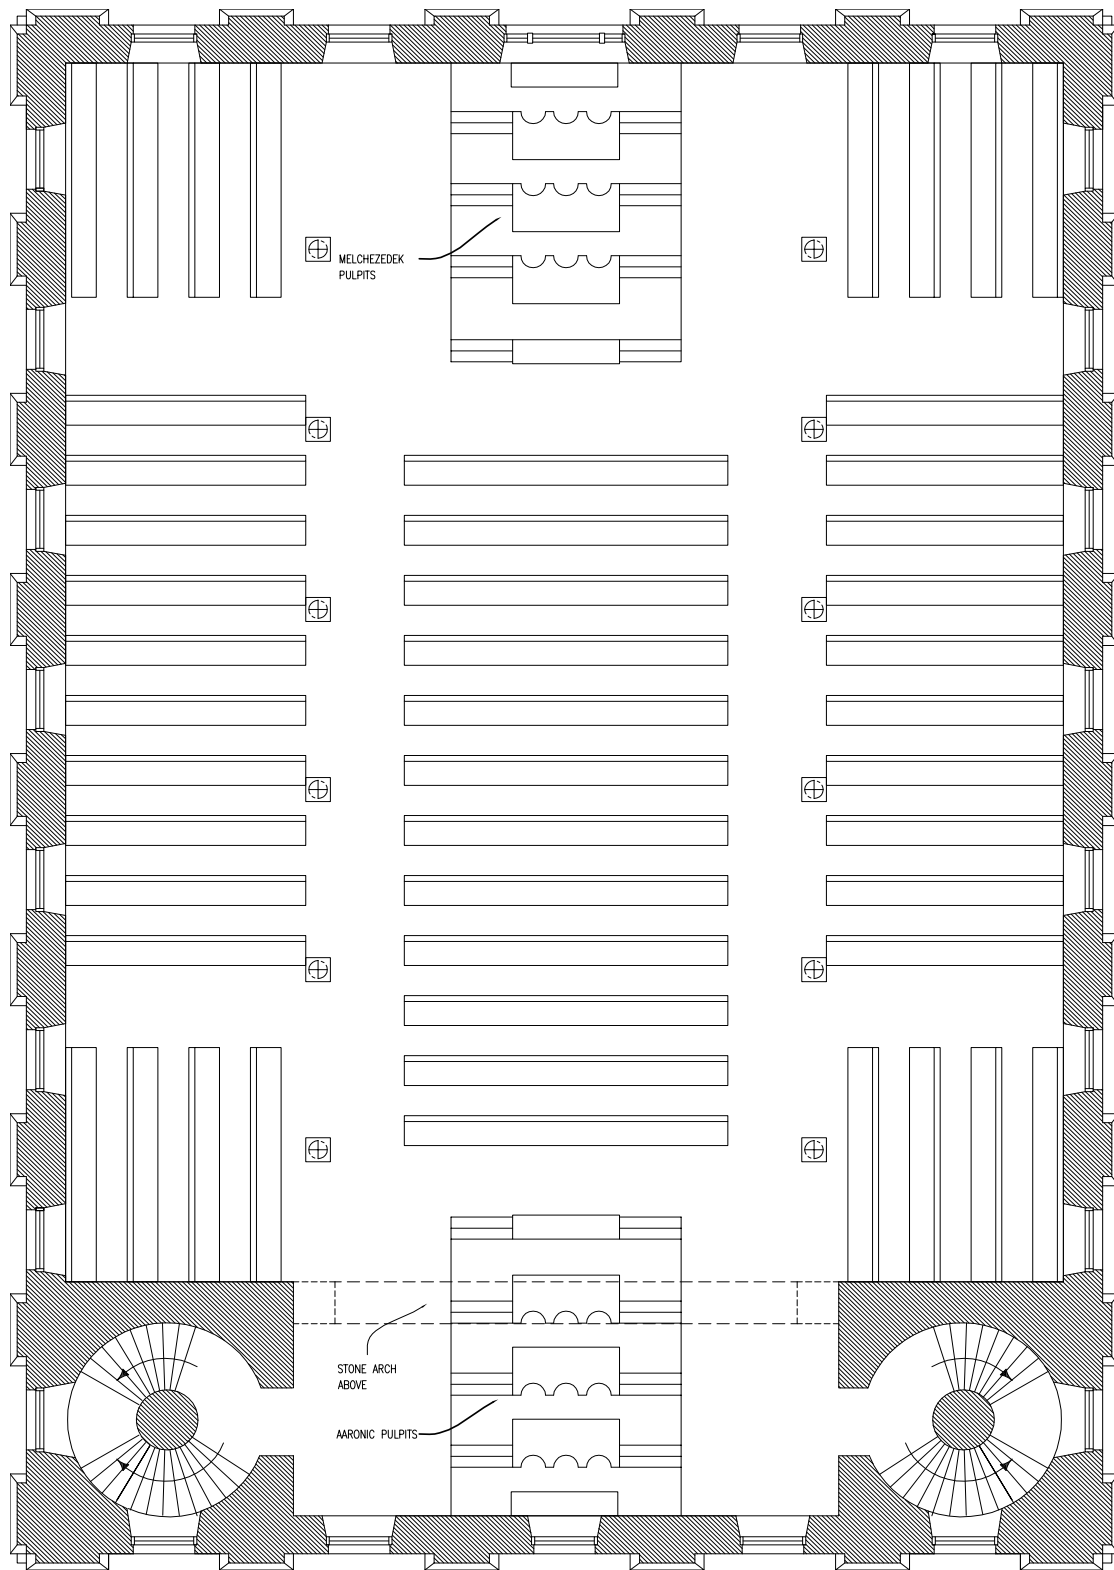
Second floor plan based on Lisle Brown and FFKR Architects reconstruction drawings. Drawn by author.
